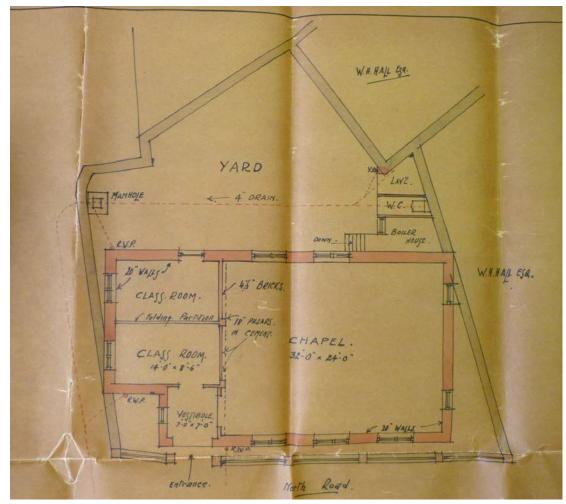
Floor plan from the original drawings of 1923 (CAC(K) WS/RD/SW/Plan 107 1923)
